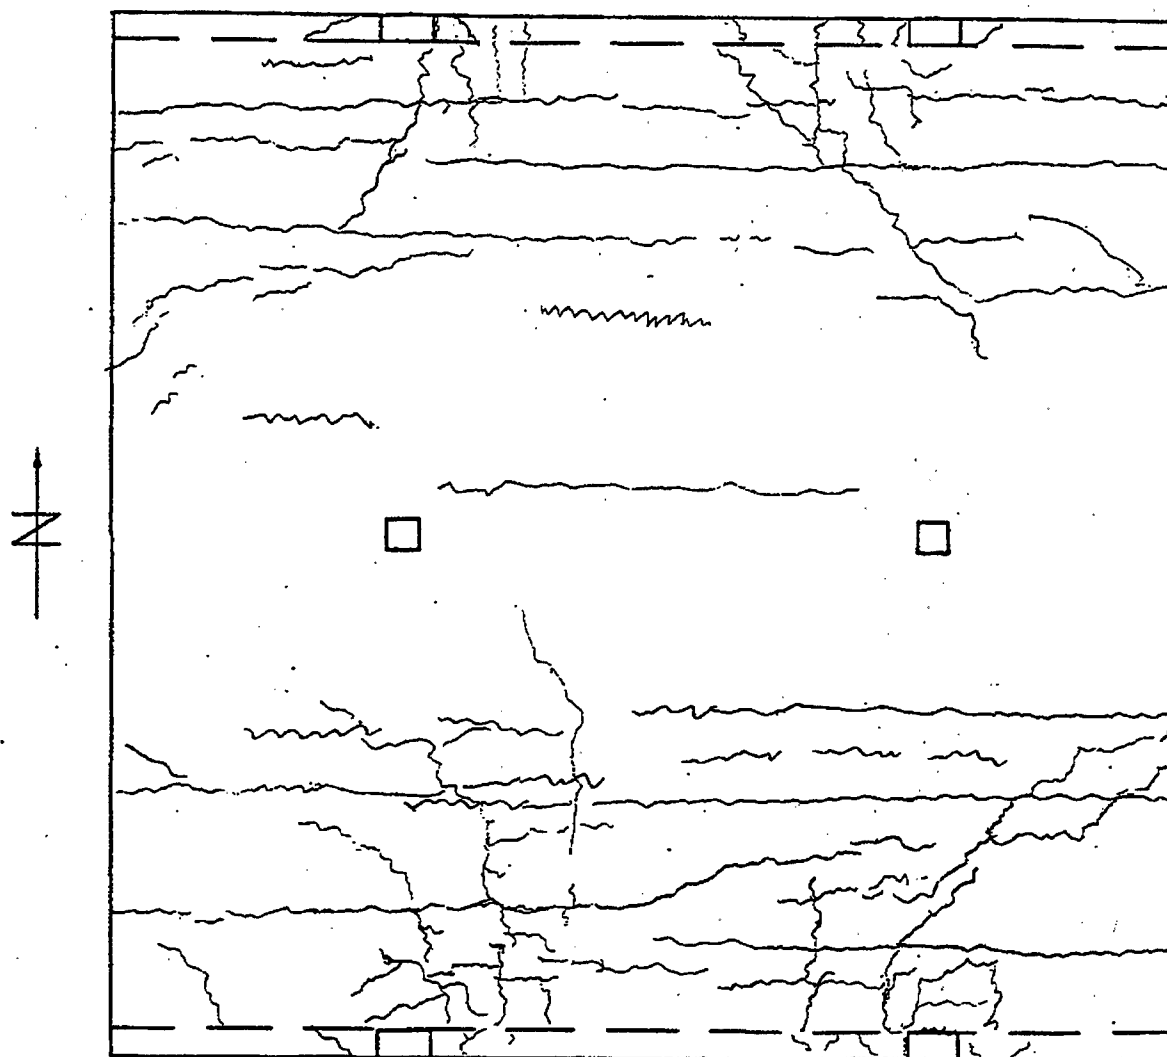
Crack Pattern, First Floor Slab, Bottom Side, Post-T420DL
